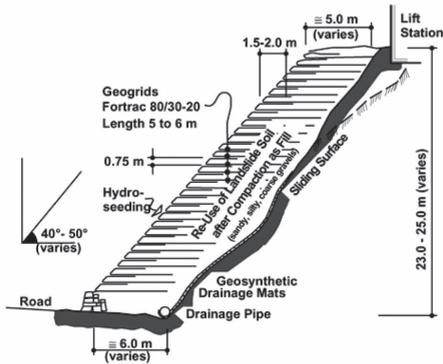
Typical cross-section of the geogrid-reinforced landslide reconstruction and stabilisation system.
